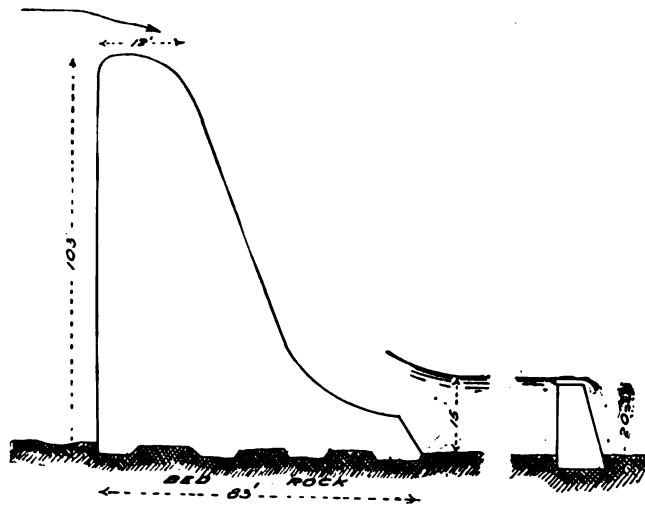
CROSS-SECTION OF TURLOCK WEIR.
